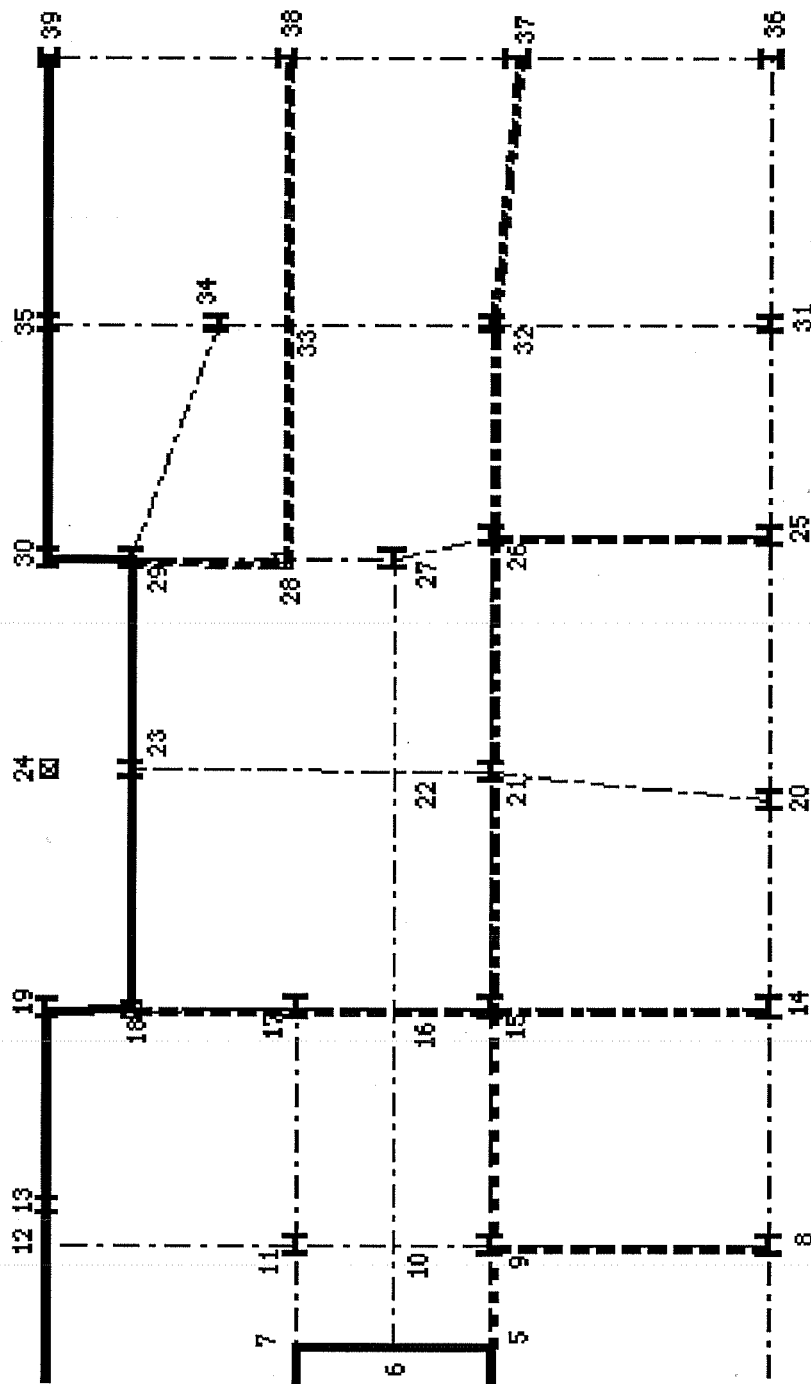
Numbering scheme for floor beam and floor nodes at Level 2 (Hotel Woodrow)
